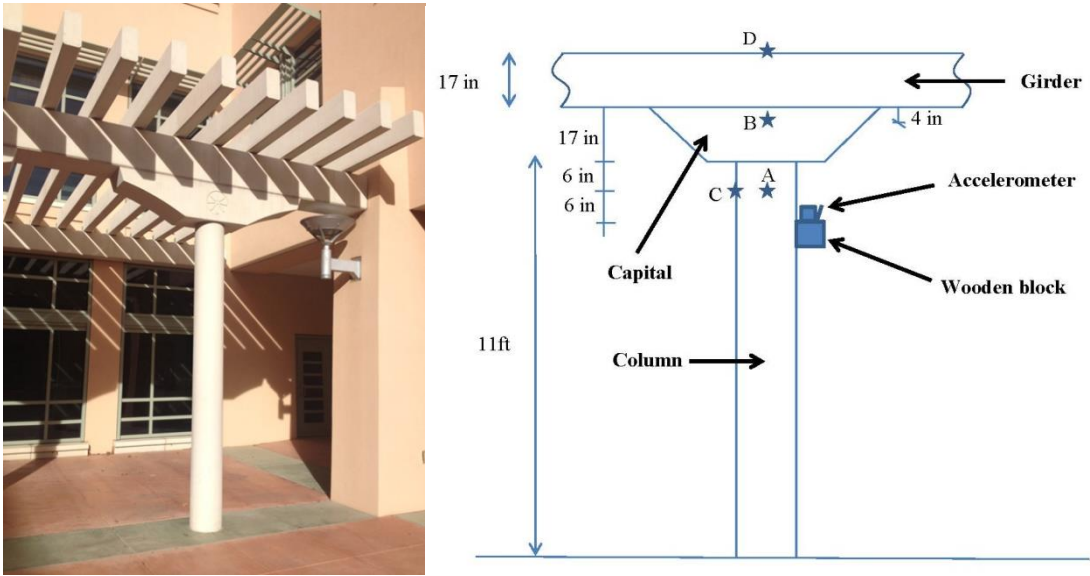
Picture and Details of Centennial Engineering Concrete Column
